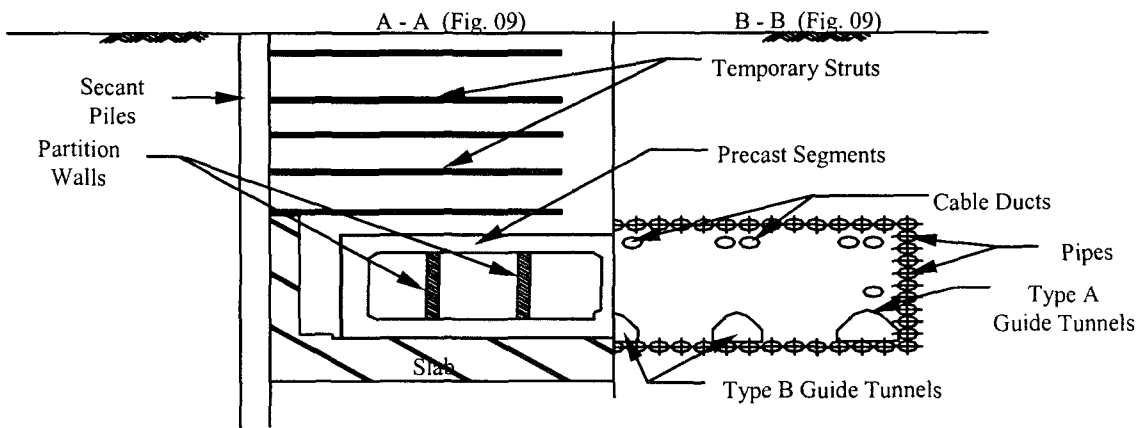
Cross-Section of ESA Layout of the Airport Underpass
